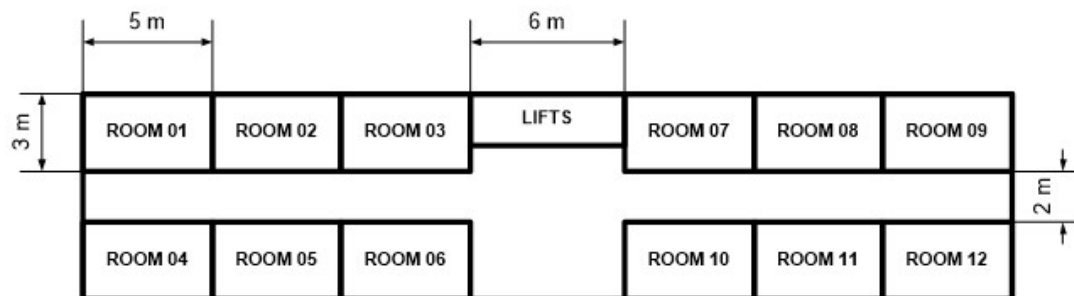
Simplified floor plan of a typical floor of the hotel building.
